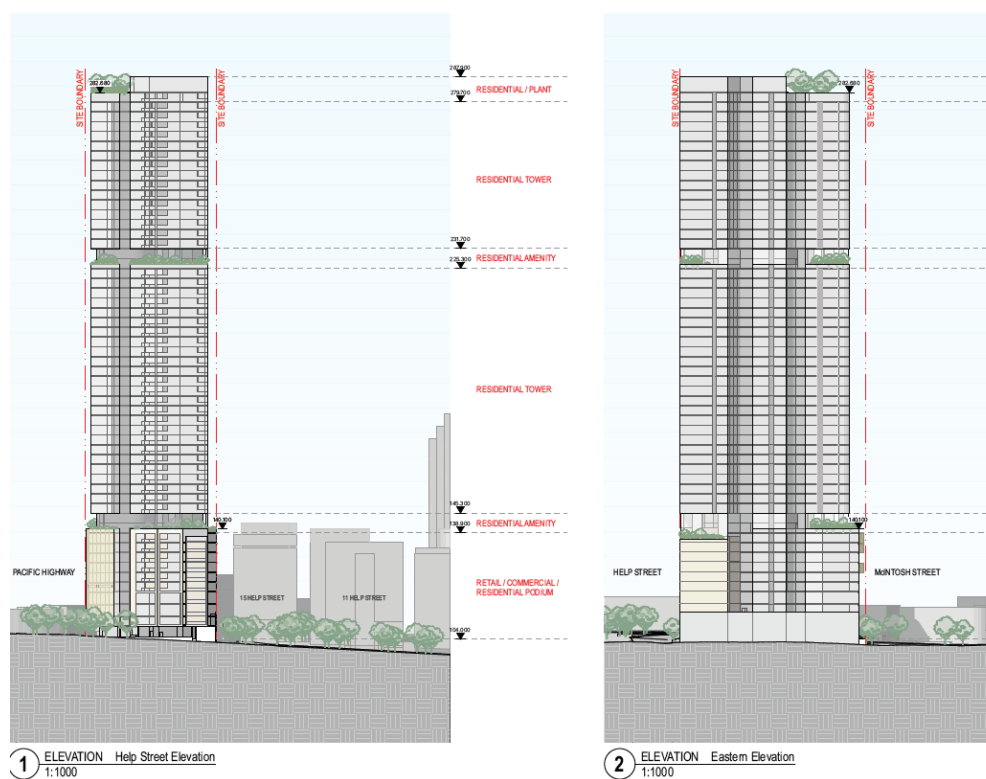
Extract of proposed plans showing the Help Street and Eastern Elevation
